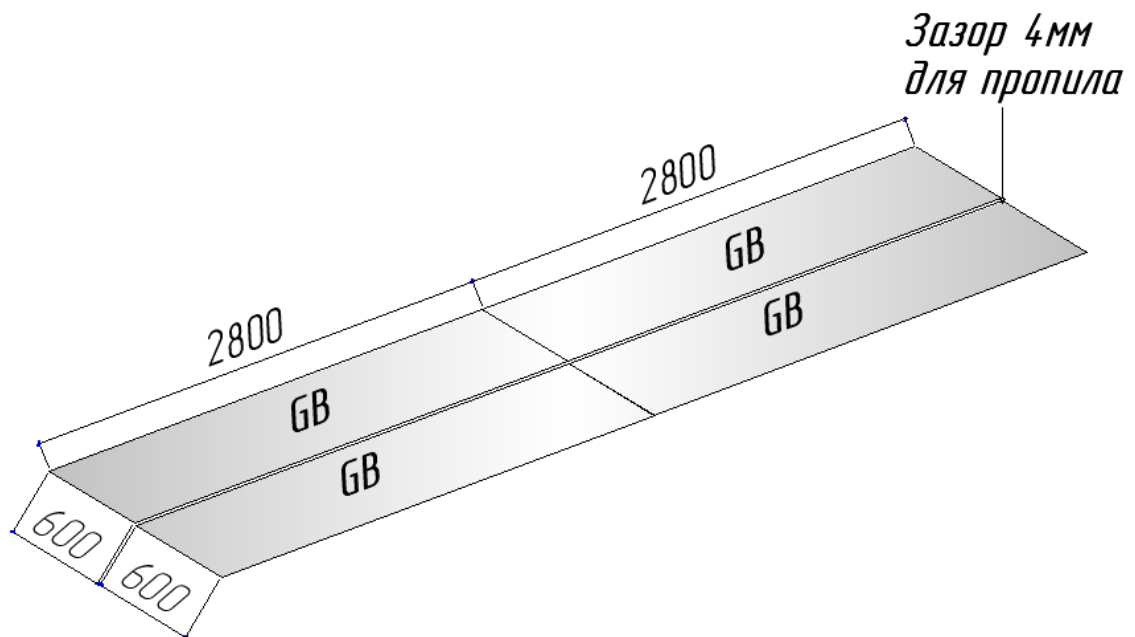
Positioning of Green Board® panels on the assembly table
